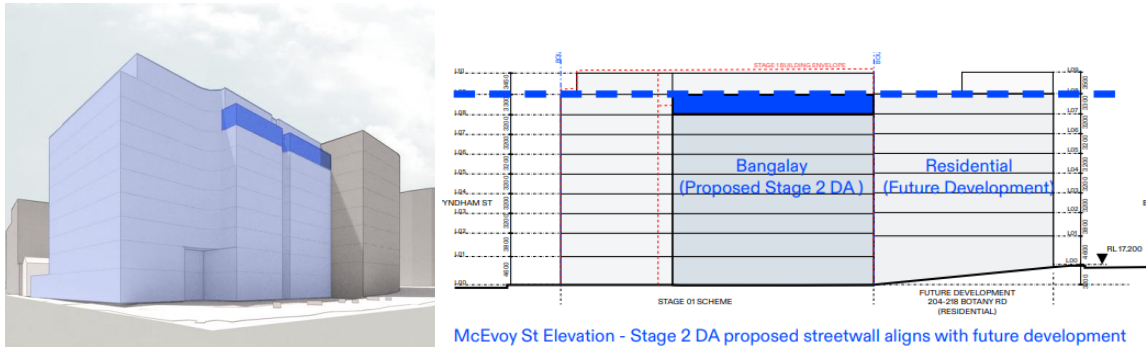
Proposed additional street wall storey (in dark blue) to McEvoy Street
